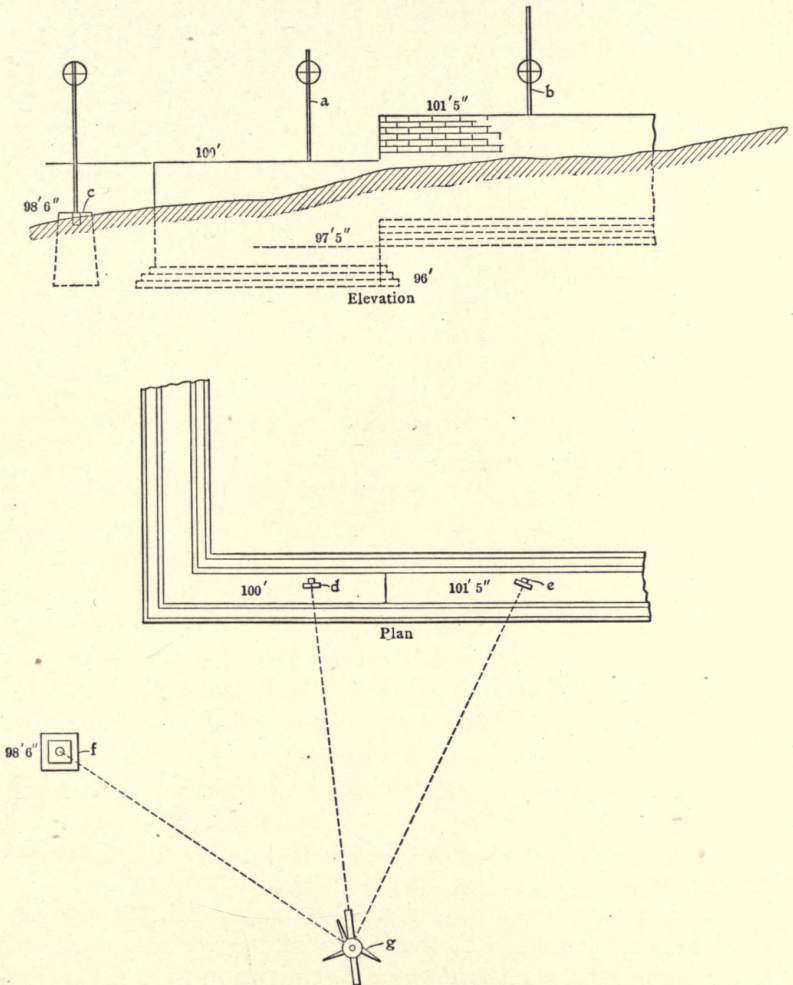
LEVELING FOUNDATIONS WITH A CROSS-HAIR INSTRUMENT.
